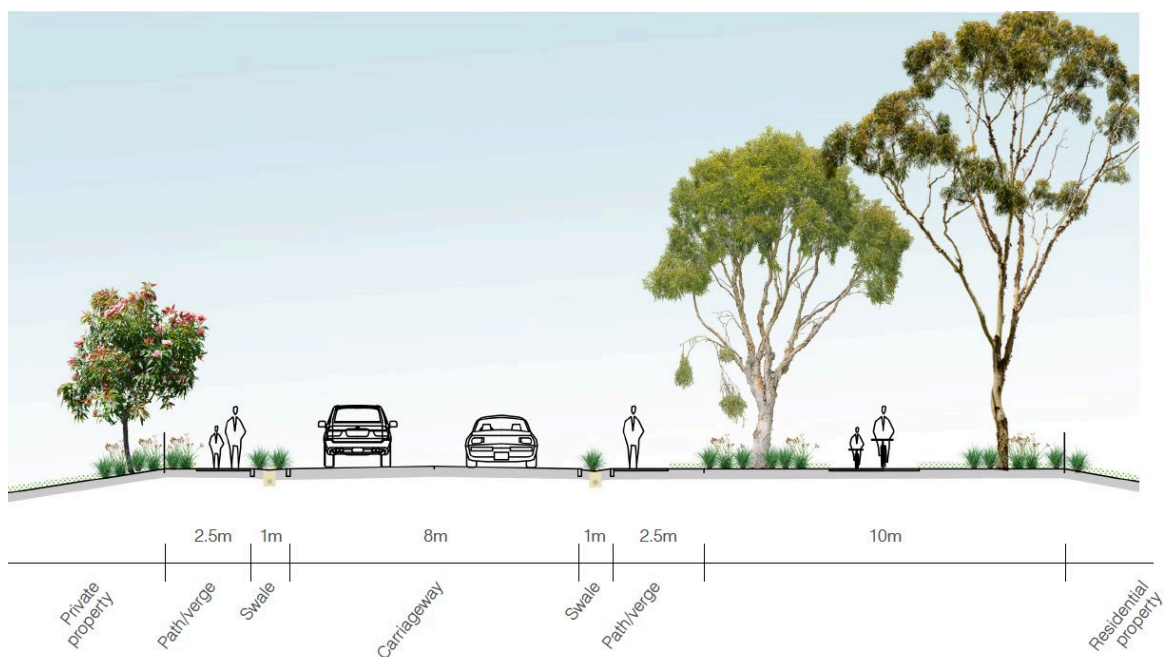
Typical street section – Local Road with pedestrian / cycle green link (15m + 10m reserve)
